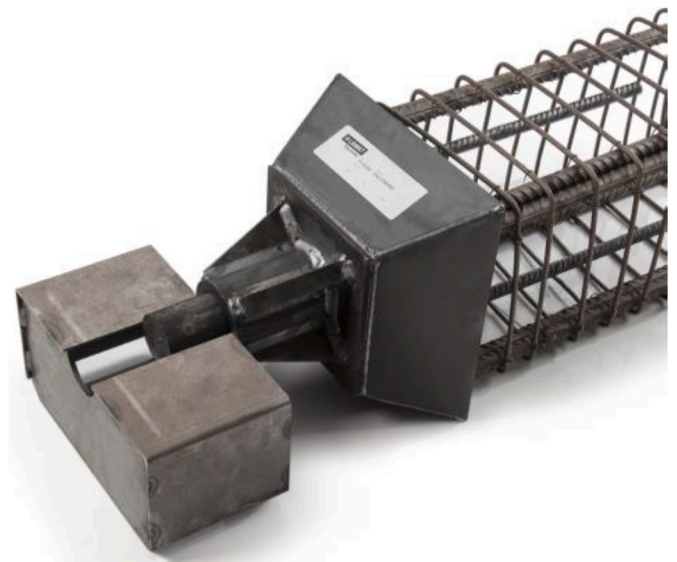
Rock shoe of a precast concrete driven energy piles [70].
